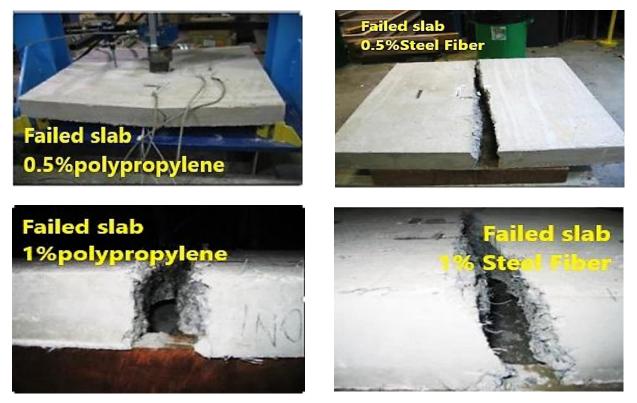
Testing of the concrete slab as presented by Hadi [26].
